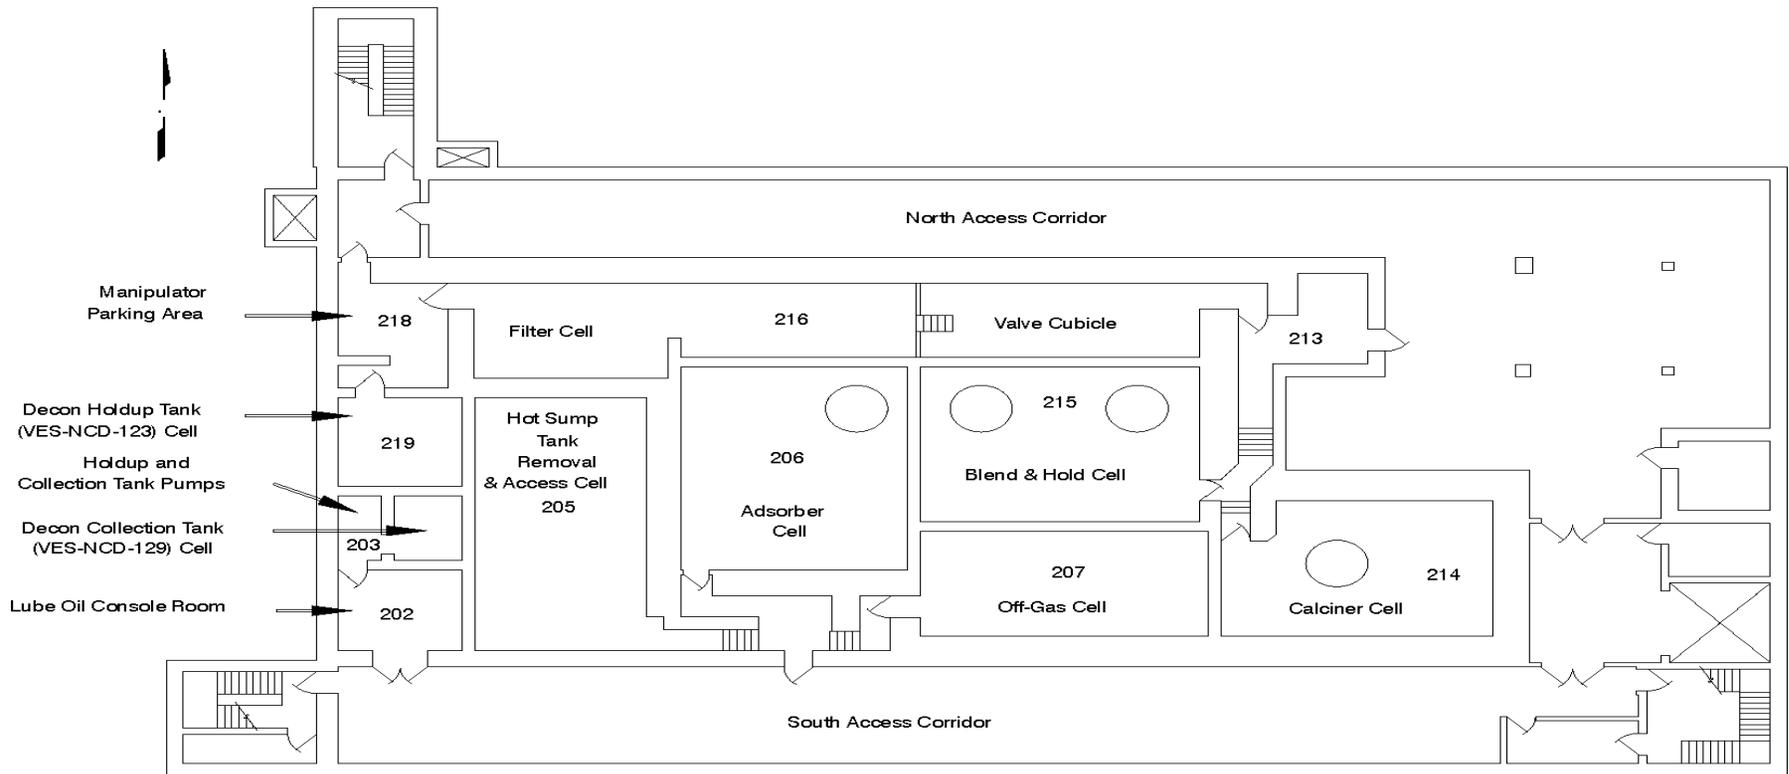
Simplified floor plan for first level of CPP-659.
